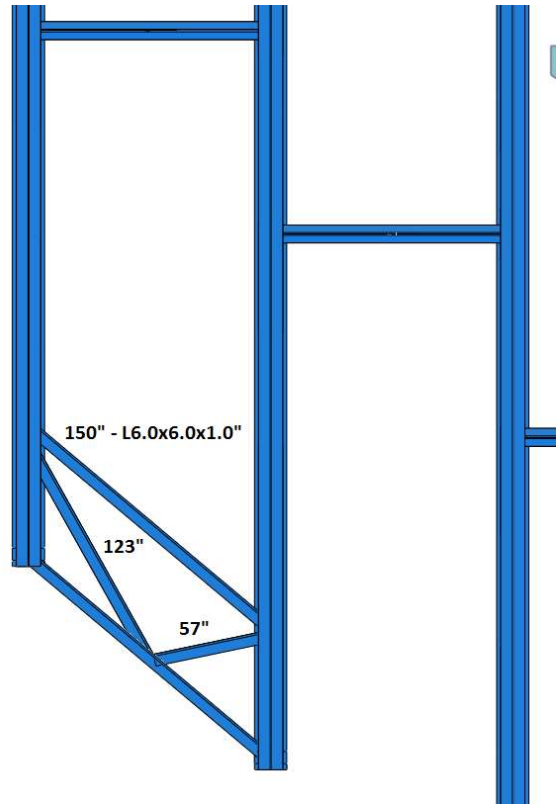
Plan view of the abutment with L152x152x25.4 mm [L6.0x6.0x1.0 in] cross-frame angles in a horizontal K-brace
